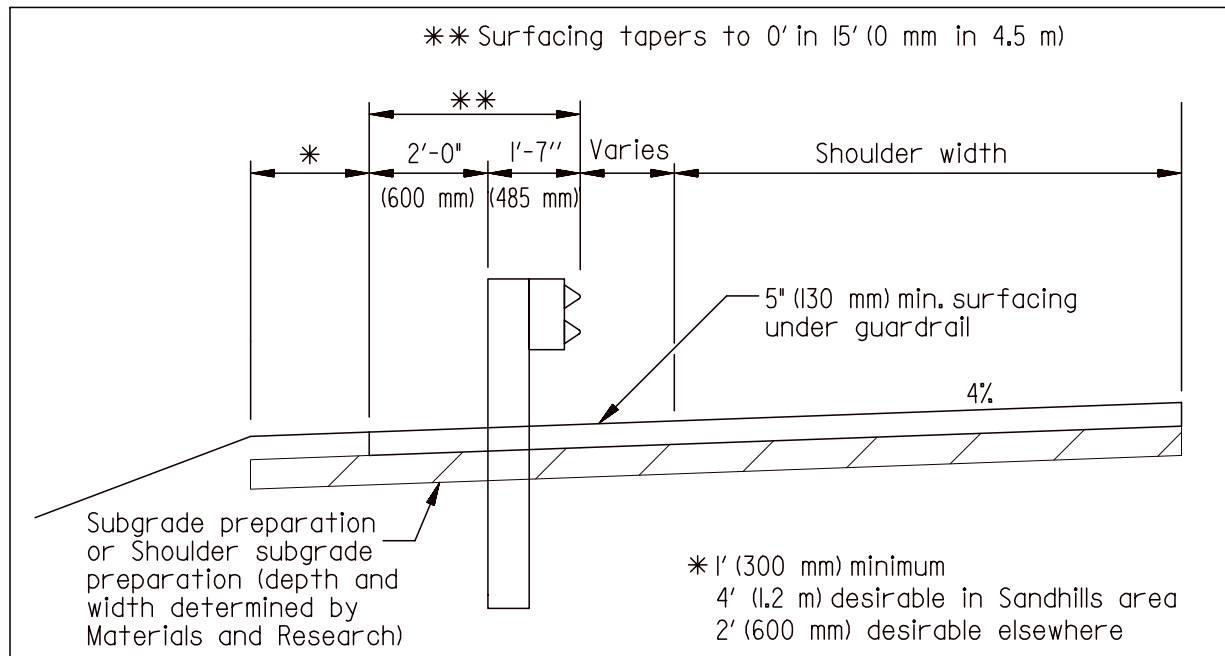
Surfaced Shoulder at Safety Beam Guardrail Location
